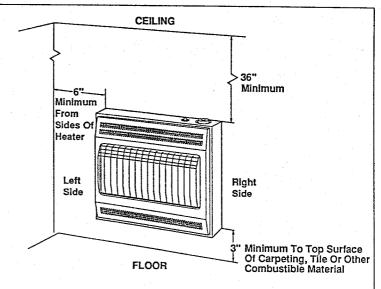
Mounting Clearances As Viewed From Front of Heater
